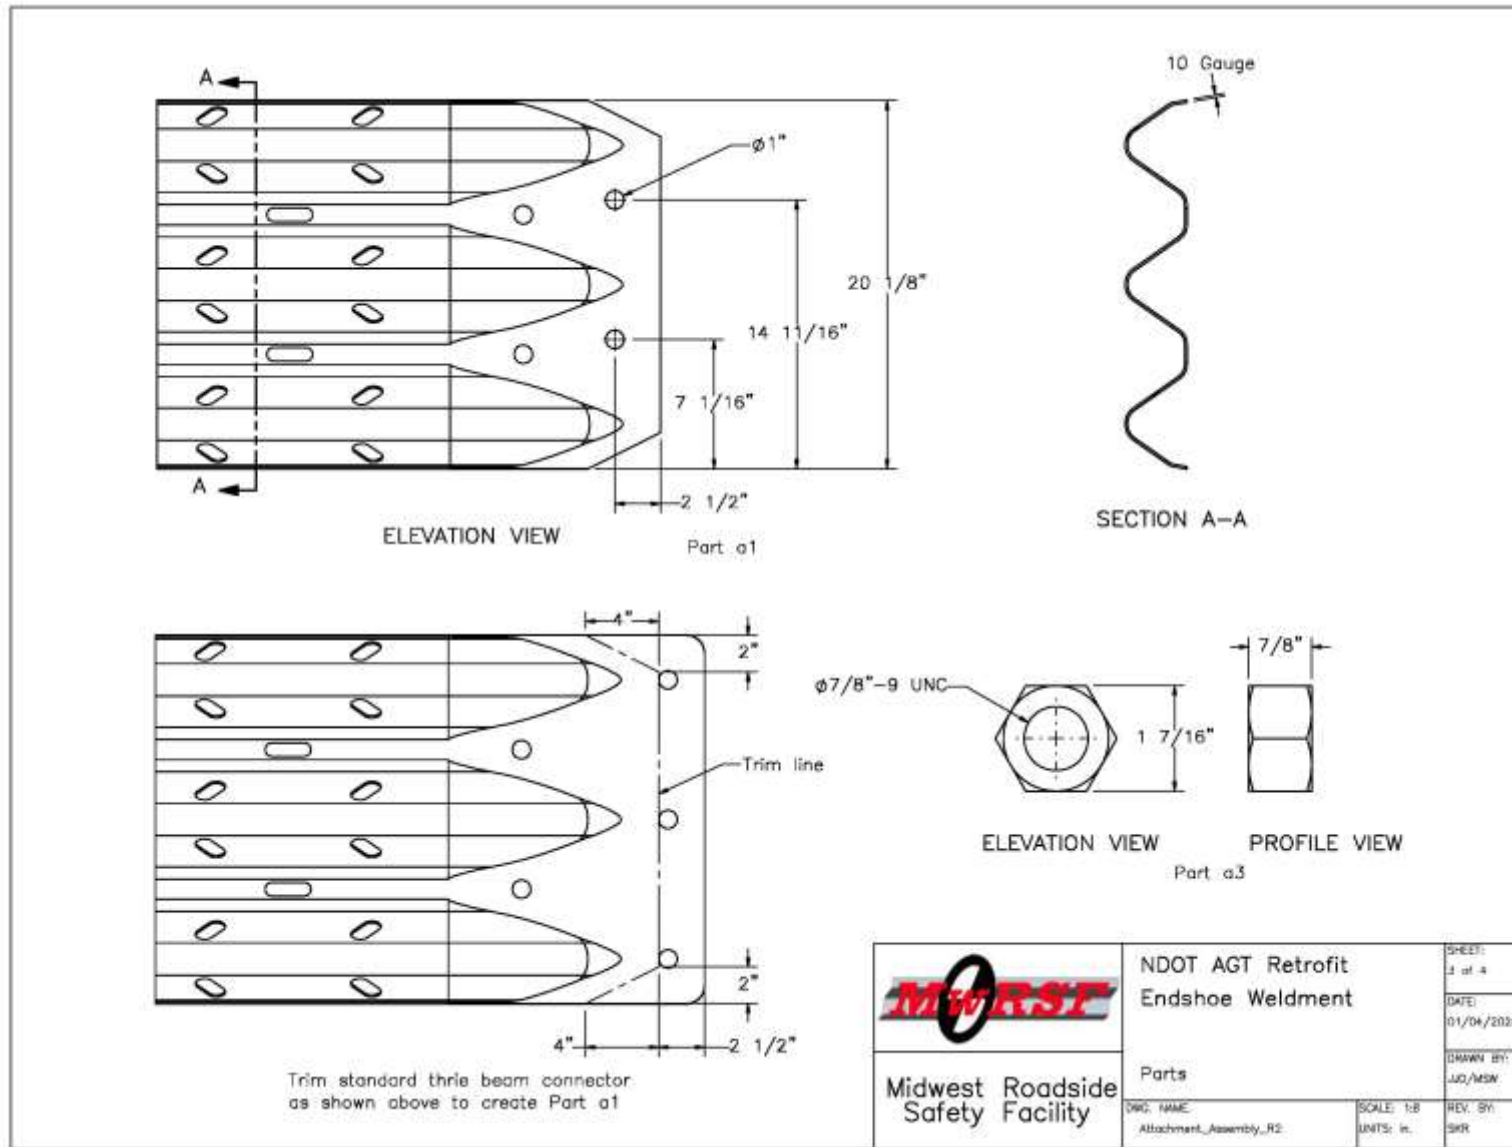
Connector Plate Assembly, Trim Lines for Thrie Beam Terminal Connector
